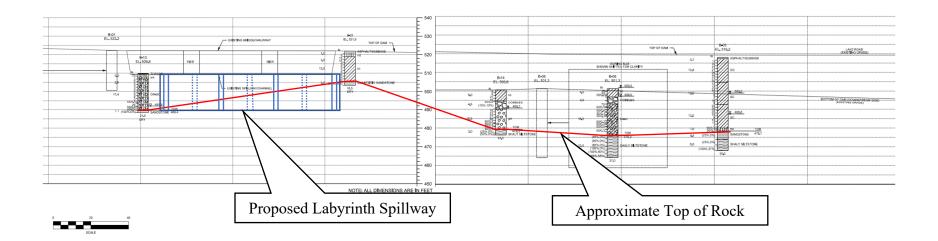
Profile View of Approximate Top of Rock and Proposed Labyrinth Spillway Location at Dam Centerline
